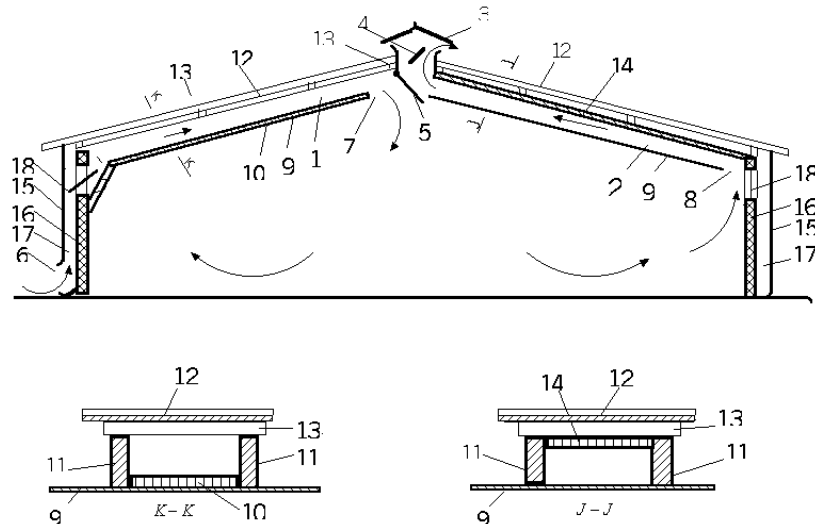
Reconstruction scheme of livestock building type "Gi&Gi":
